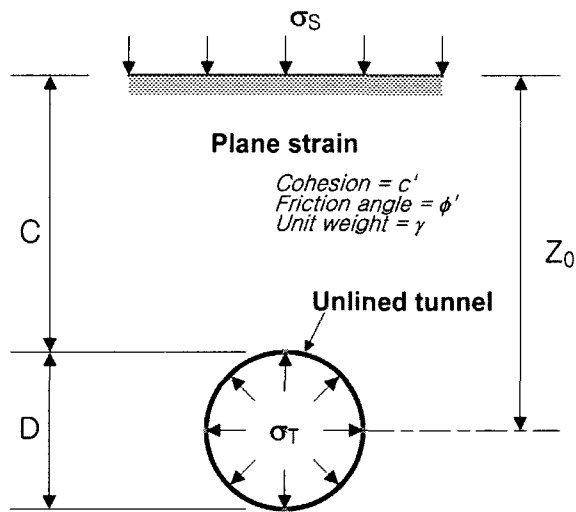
Geometry of an unlined circular plane strain tunnel (C: tunnel embedded depth from tunnel crown to surface, D: tunnel diameter,  $\sigma_s$ : surface surcharge load,  $\sigma_T$ : tunnel internal pressure,  $Z_0$ : tunnel embedded depth from tunnel centre to surface)
